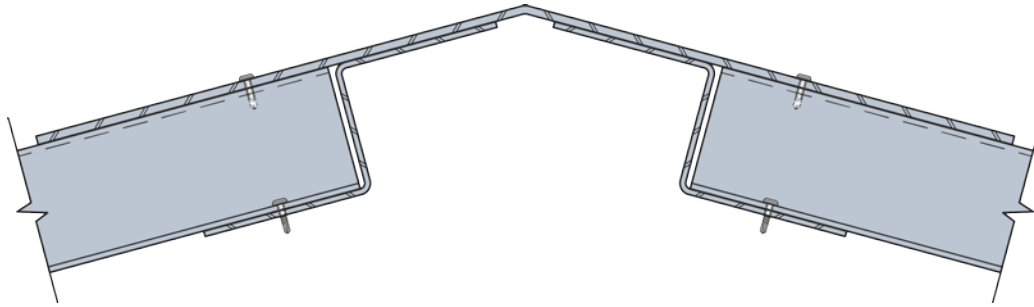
Spanning Zees at Ridge or Hip to Support Deck
